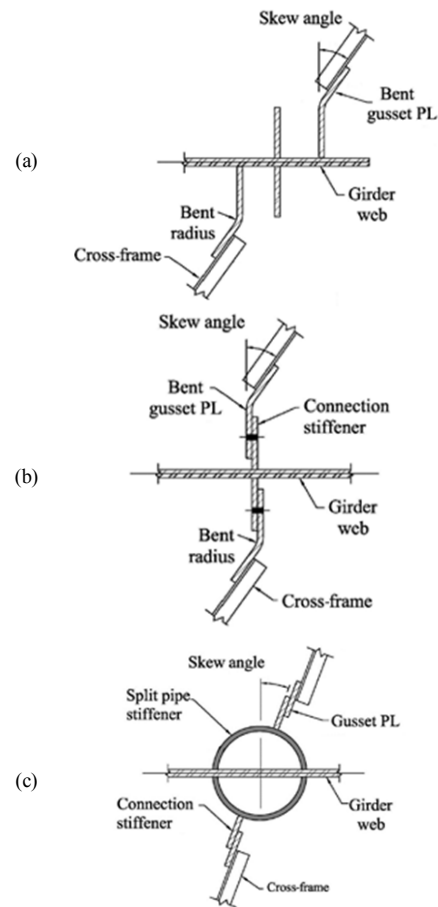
Cross-frames connection details investigated in the present study: (a) bent plate connection in US13 Bridge abutment skew support, (b) bent plate connection in US13 Bridge pier skew support, and (c) proposed pipe stiffener connection.
